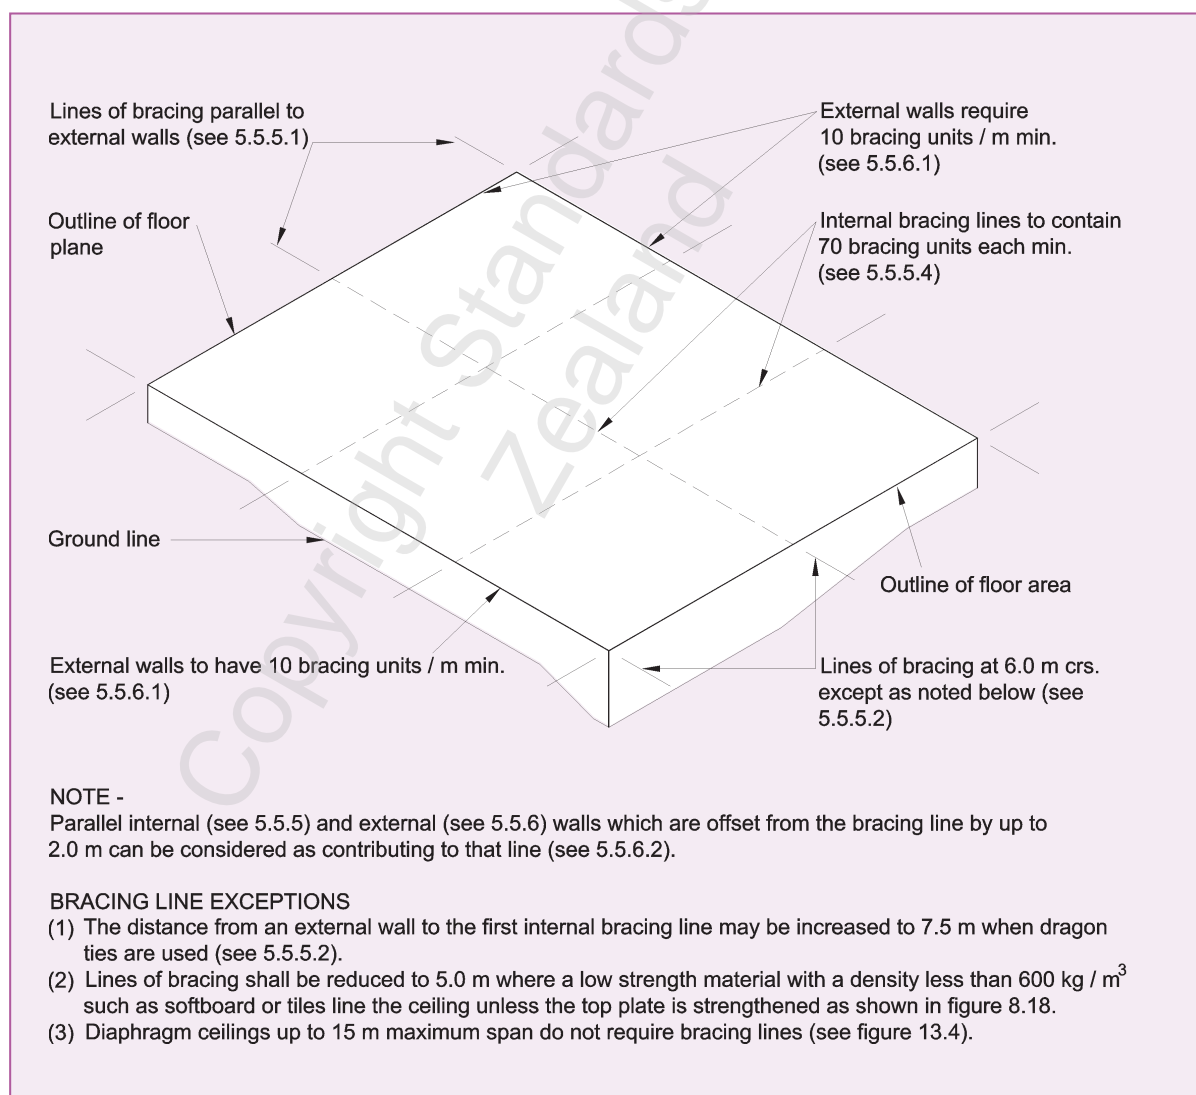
Distribution of bracing lines (see 5.5.5.1)
